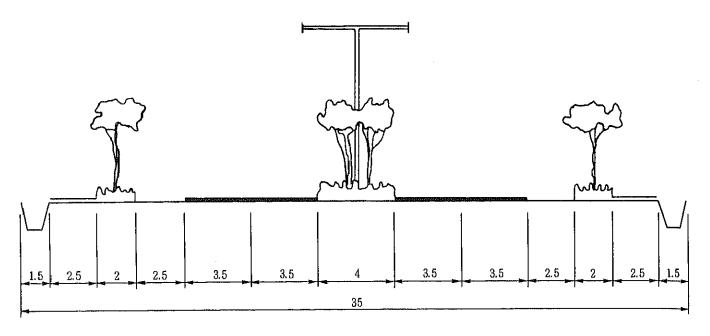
Design of Road Section A-A, B-B and C-C
